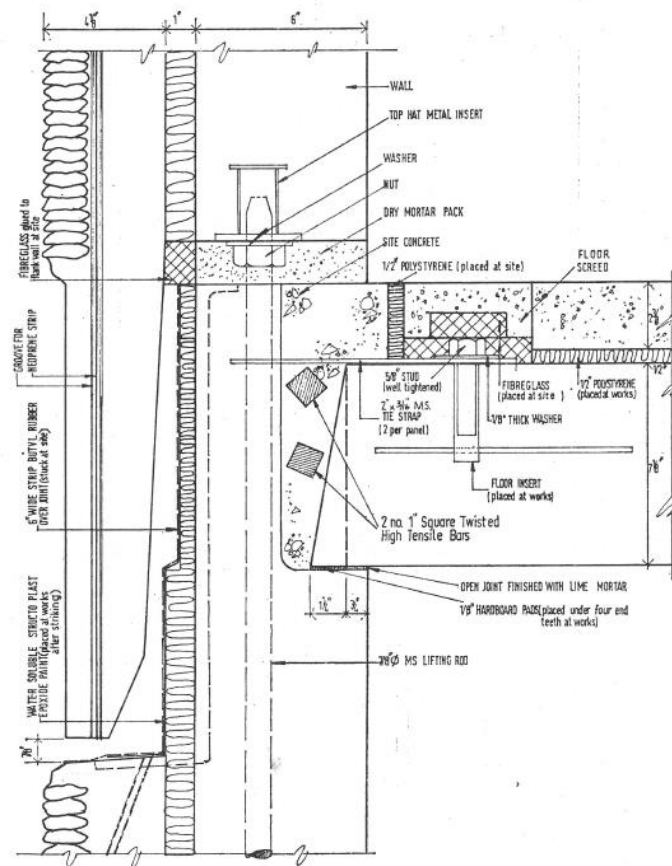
b Detail D showing the joint between the floor slab and the flank wall (HMSO, 1968).
